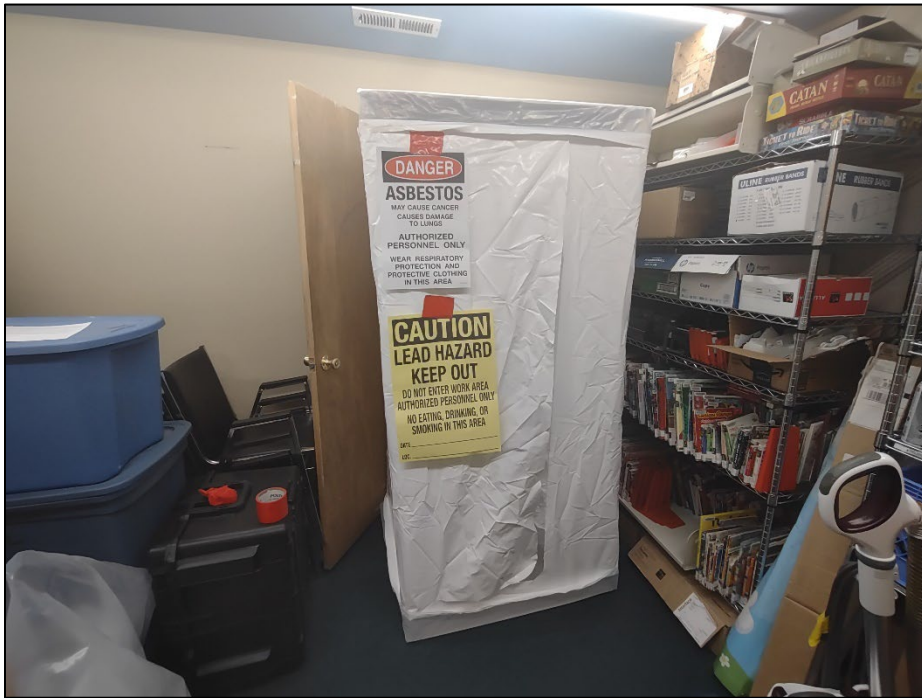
July 29, 2024. Main Floor: Containment installed outside of the office. The other side of the containment has the damaged drywall ceiling and LBP on the stairwell wooden floor.
